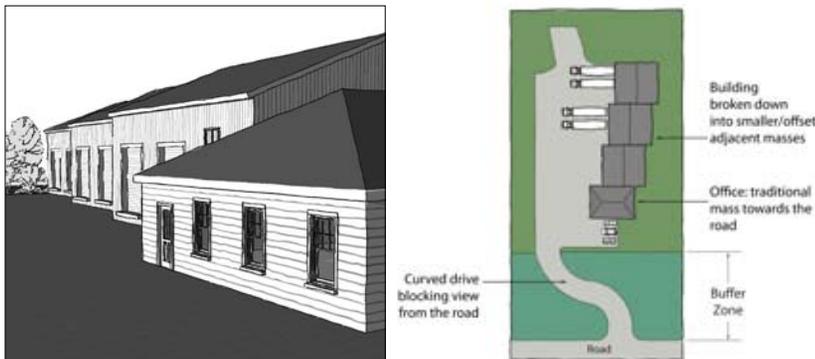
These illustrations show how orienting the narrow facade toward the street, offsetting modular buildings to break down the mass of the building, and maintaining a deep buffer with meandering driveway can be effectively used to reduce the visual impact of industrial/warehouse buildings.
